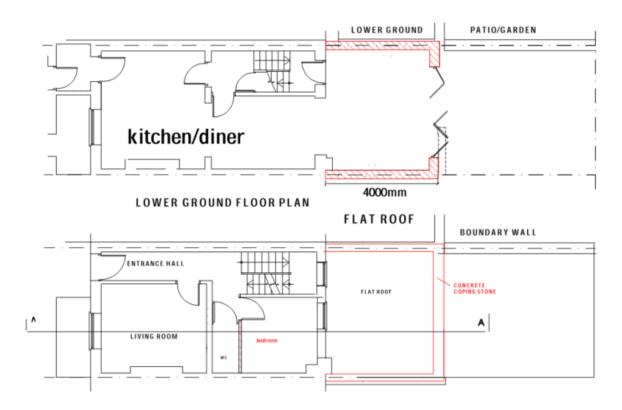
Proposed lower ground floor (top) and upper ground floor (bottom) plans.
